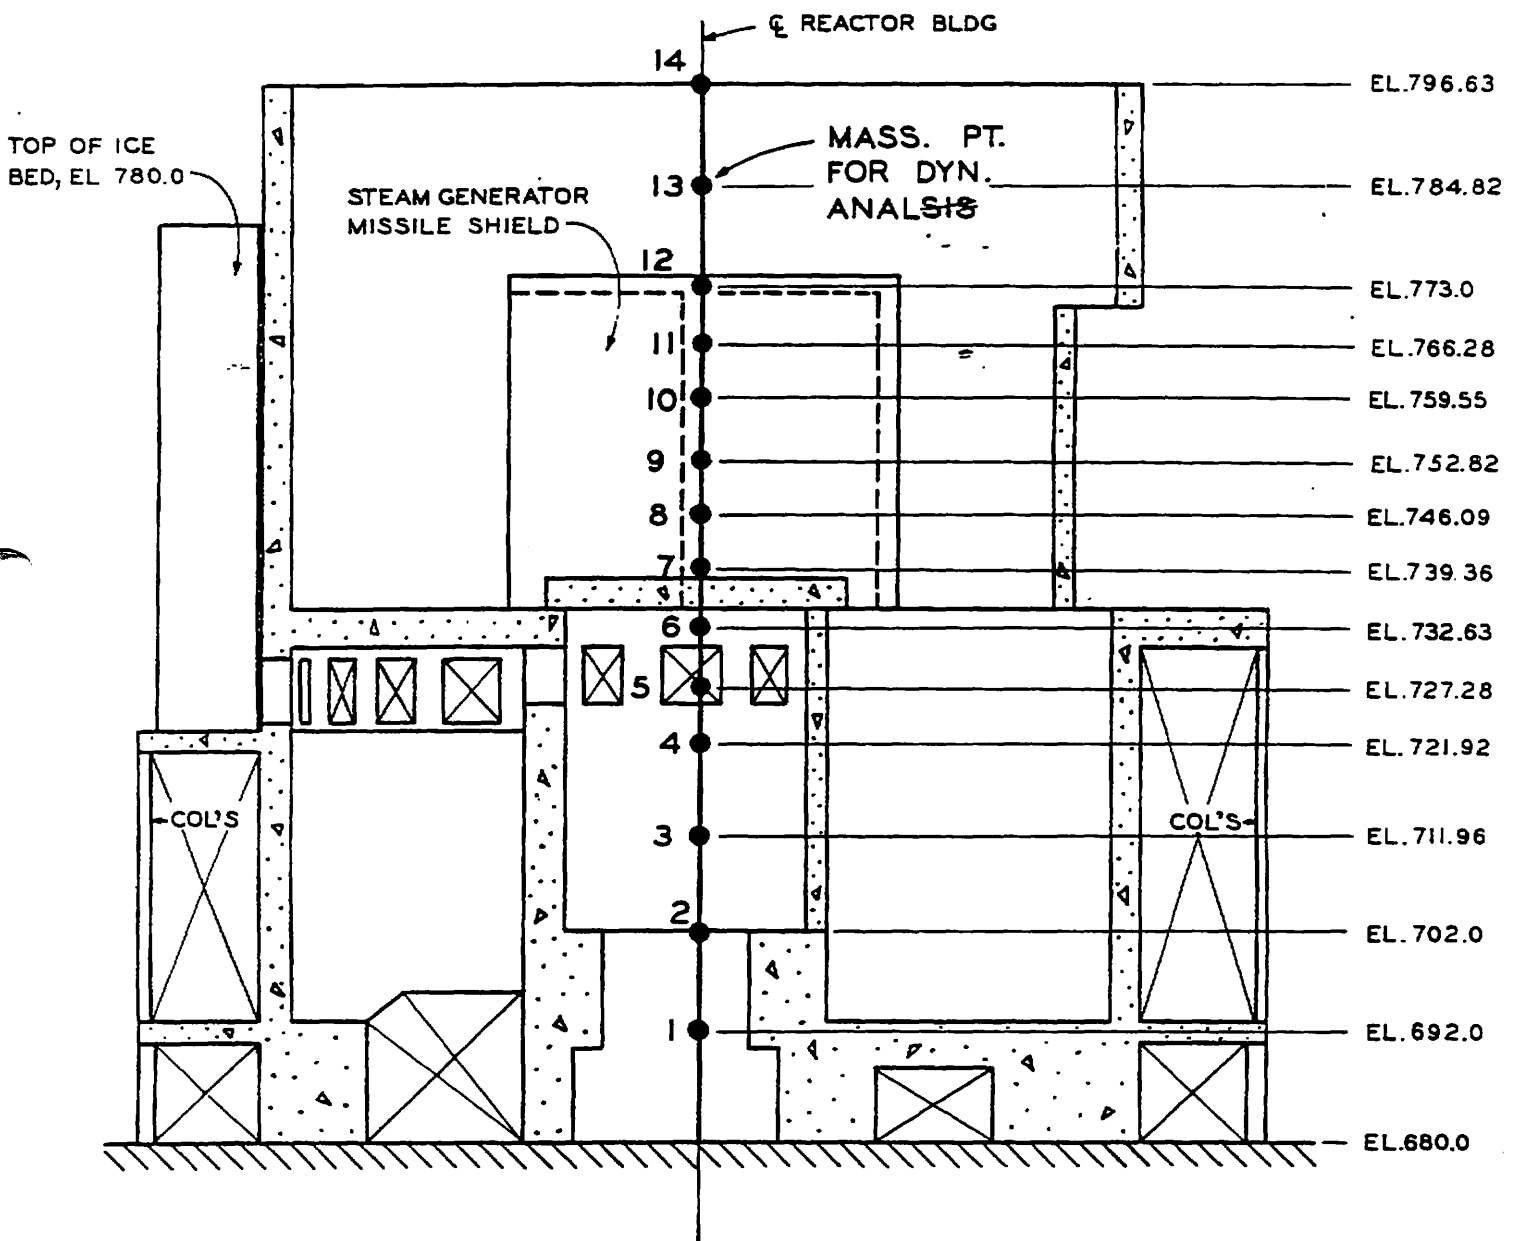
Reactor Building, Interior Concrete Structure Sectional Elevation
